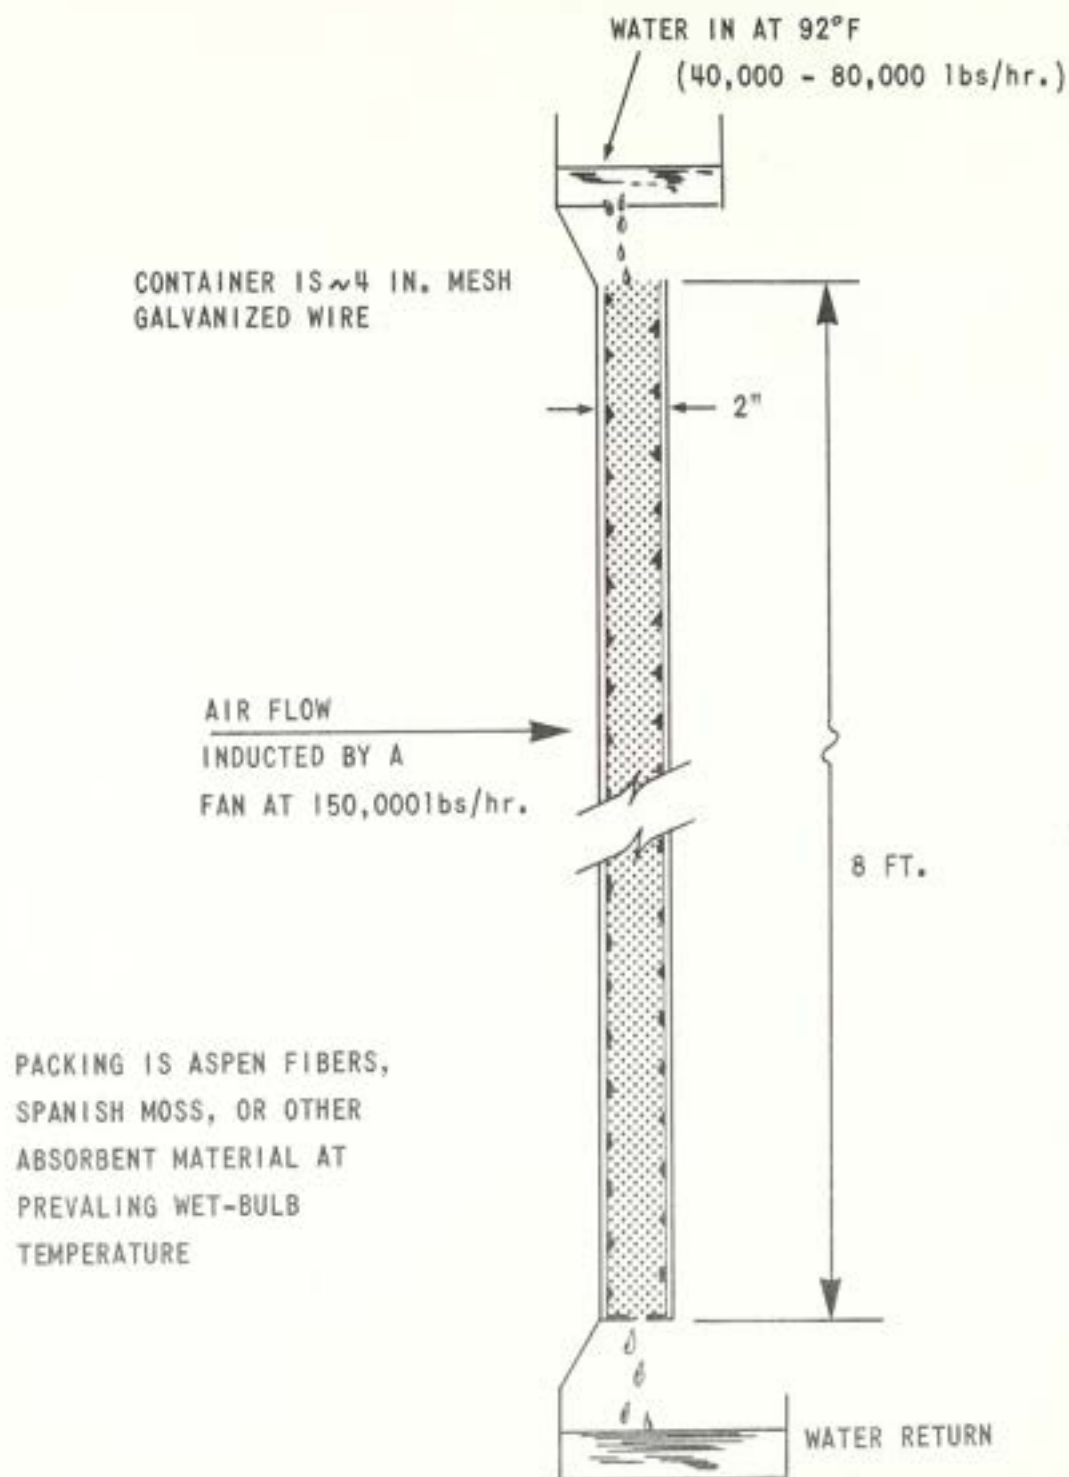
EVAPORATIVE-COOLER PAD ASSEMBLY
